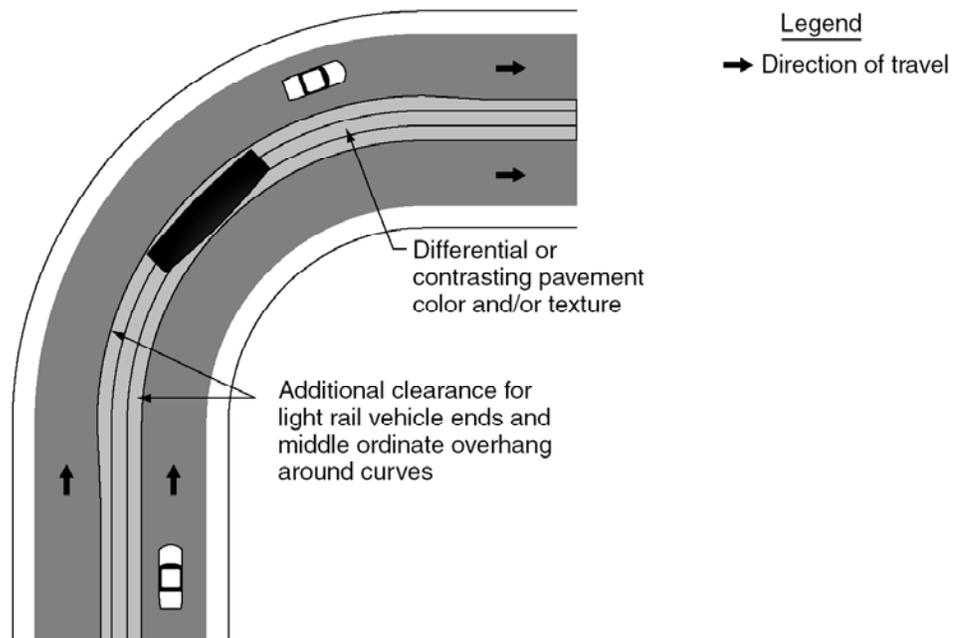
C-8. Typical Light Rail Transit Vehicle Dynamic Envelope Pavement Markings
